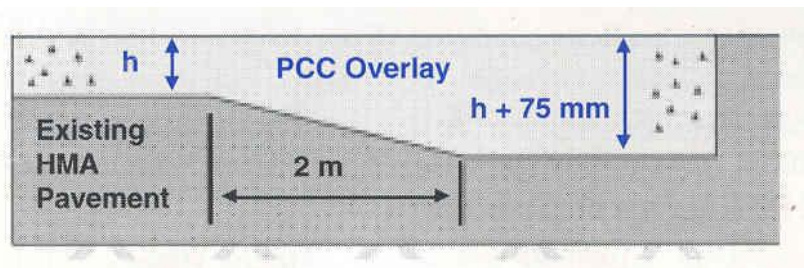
Cross Section View of the Transition Slab adjoining Asphalt Pavement
